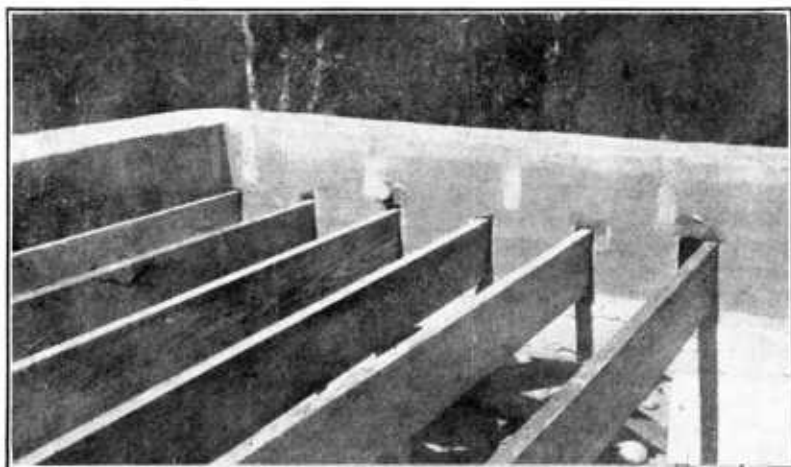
First-story joists resting on foundation wall. The wood inserts above the joists provide nailing for skirting. (Courtesy of H. B. Humphrey.)
